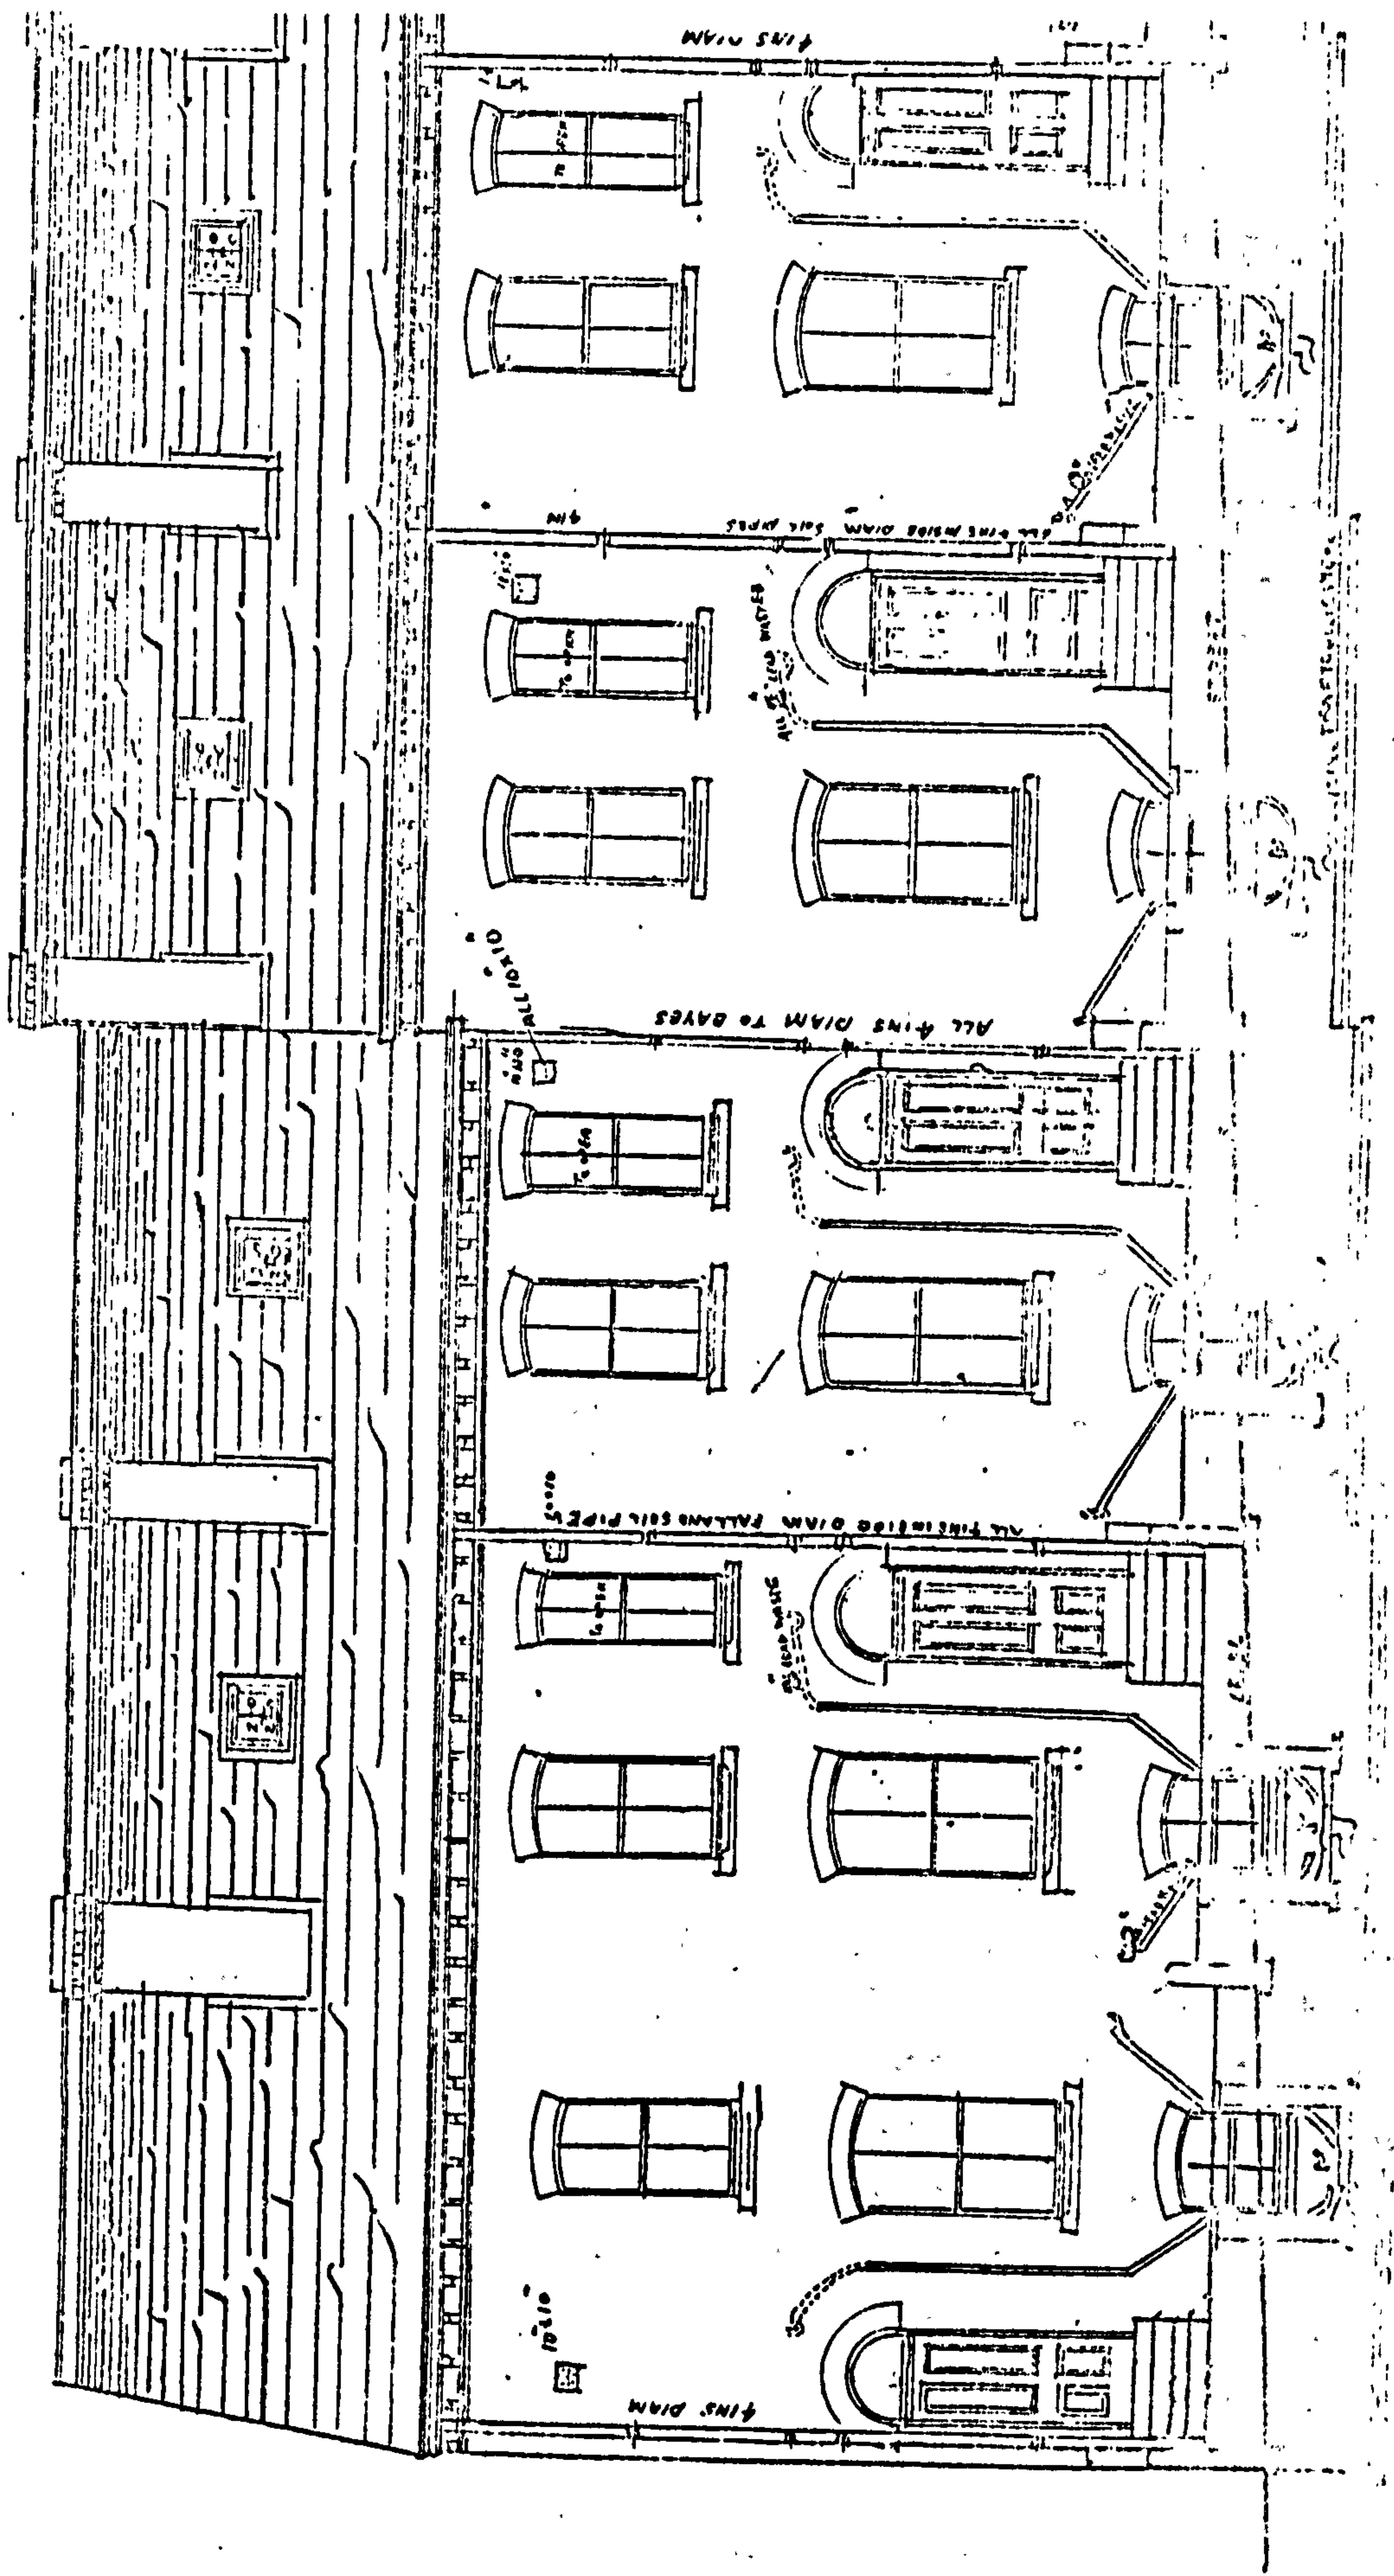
Deposited elevation of houses in Tong Road, Wortley (A. Neill 1883).
